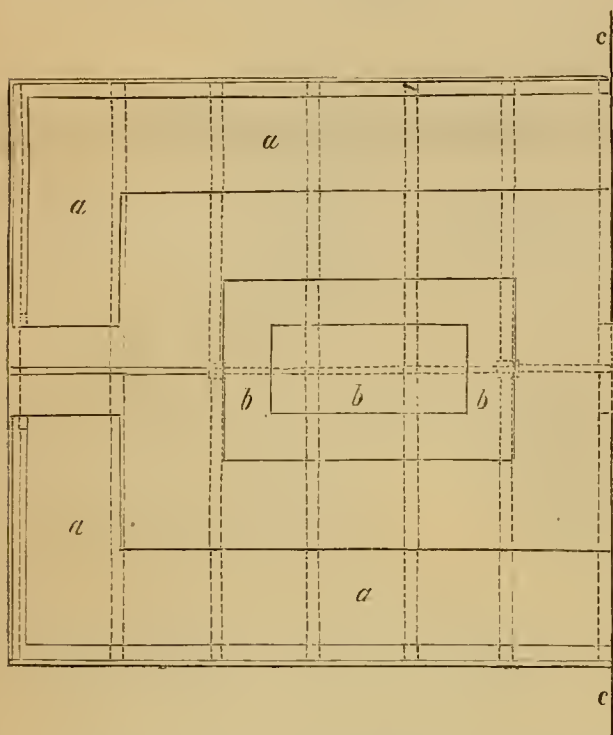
GROUND PLAN OF GREENHOUSE.
